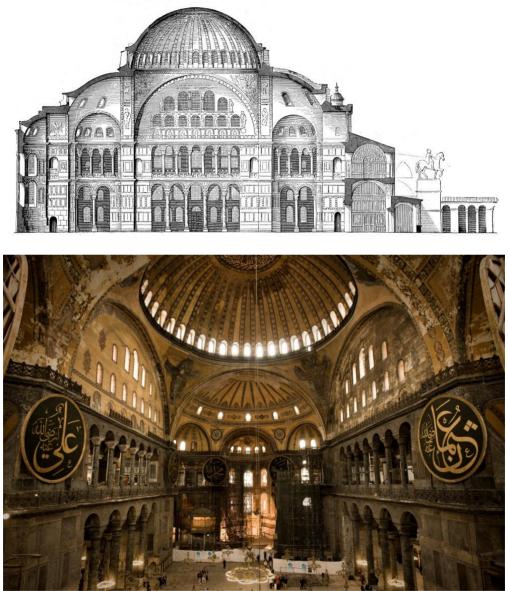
Cross section (top) and interior view (bottom) of the dome of Hagia Sofia.
